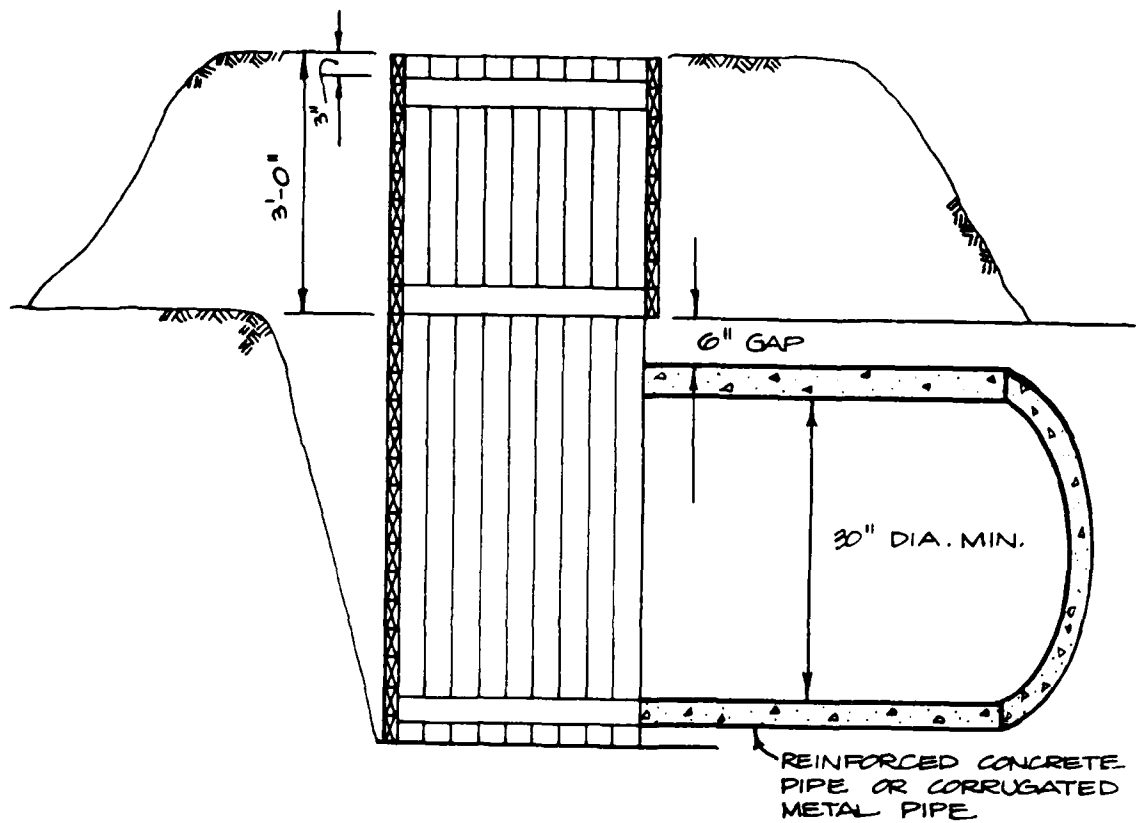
Typical Entryway to Buried Shelter With Culvert Shown.
